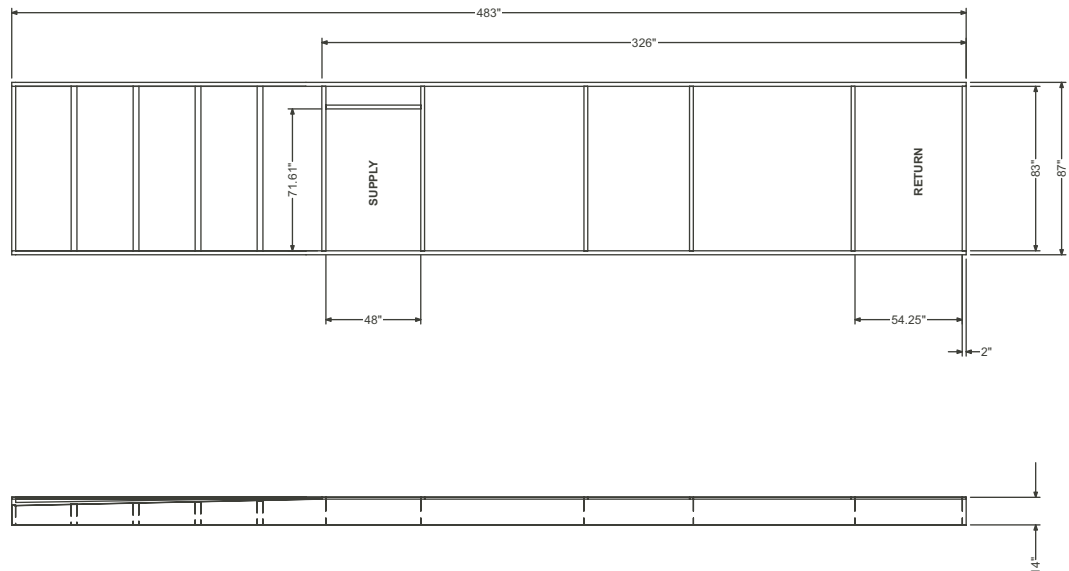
GENERAL ARRANGEMENT DRAWING
